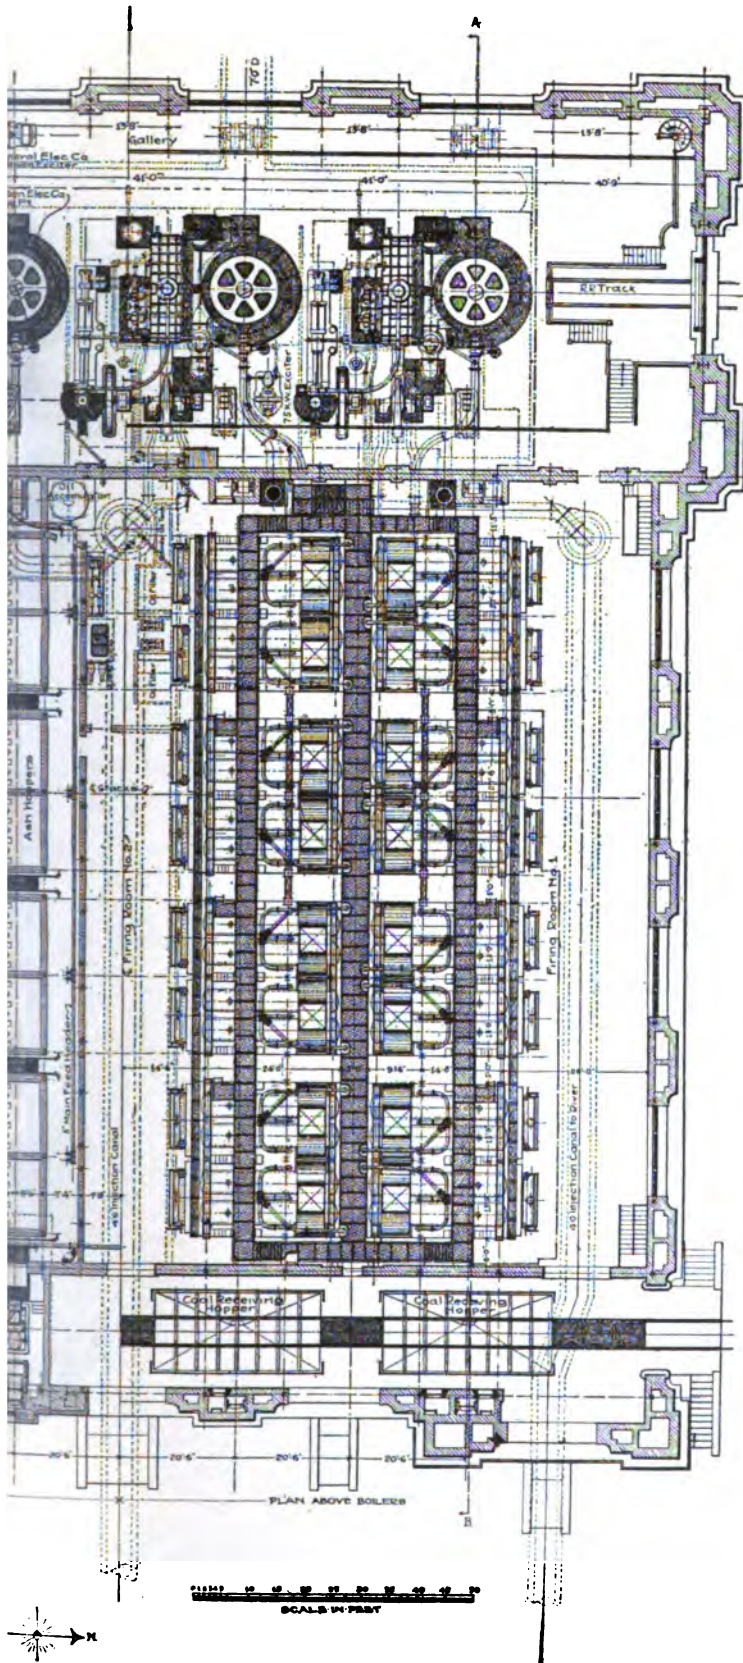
General Plan of Fisk Street Plant, Chicago, showing
